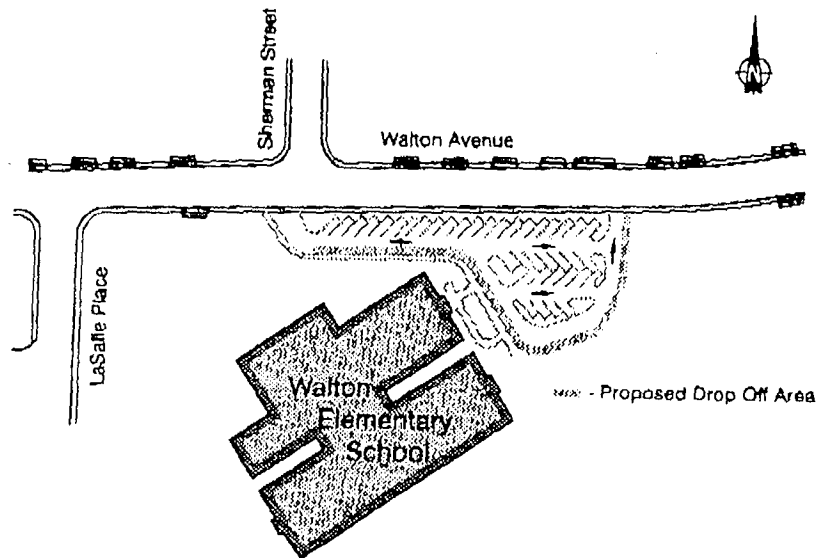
EXPANDED PICK-UP/DROP-OFF AND PARKING FACILITY
